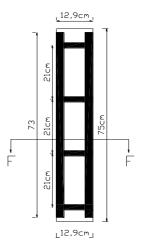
Concrete dimensions and details of reinforcements of tested columns.
